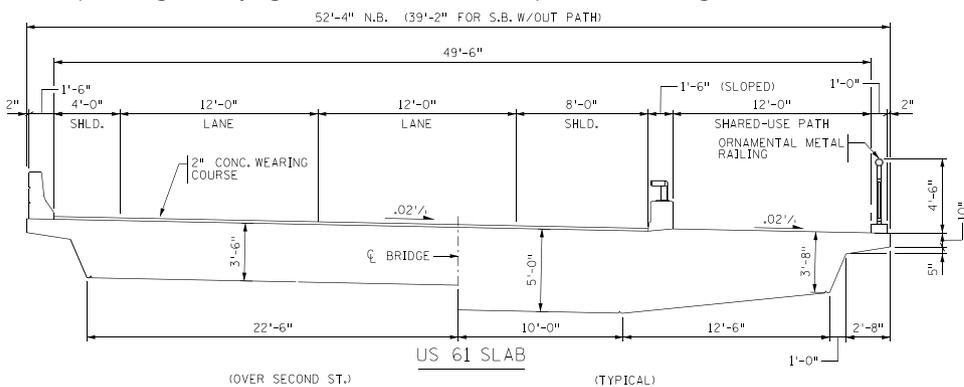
Typical cross section of the U.S. Route 61 south approach bridge carrying northbound traffic on the typical 5 ft depth (right) and the reduced depth over Second Street (left). Figure: Jeffrey Cavallin.
